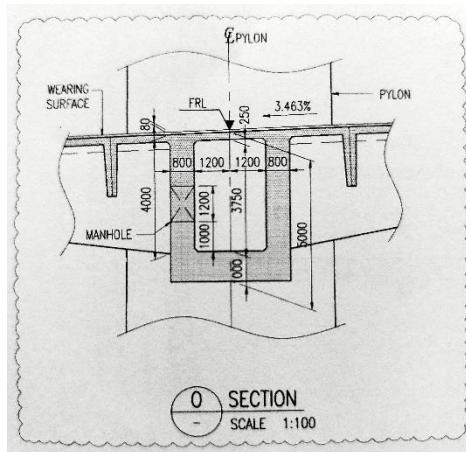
CROSS SECTION OF CROSS BEAM OF PYLON AS SEEN FROM THE PLAN VIEW
